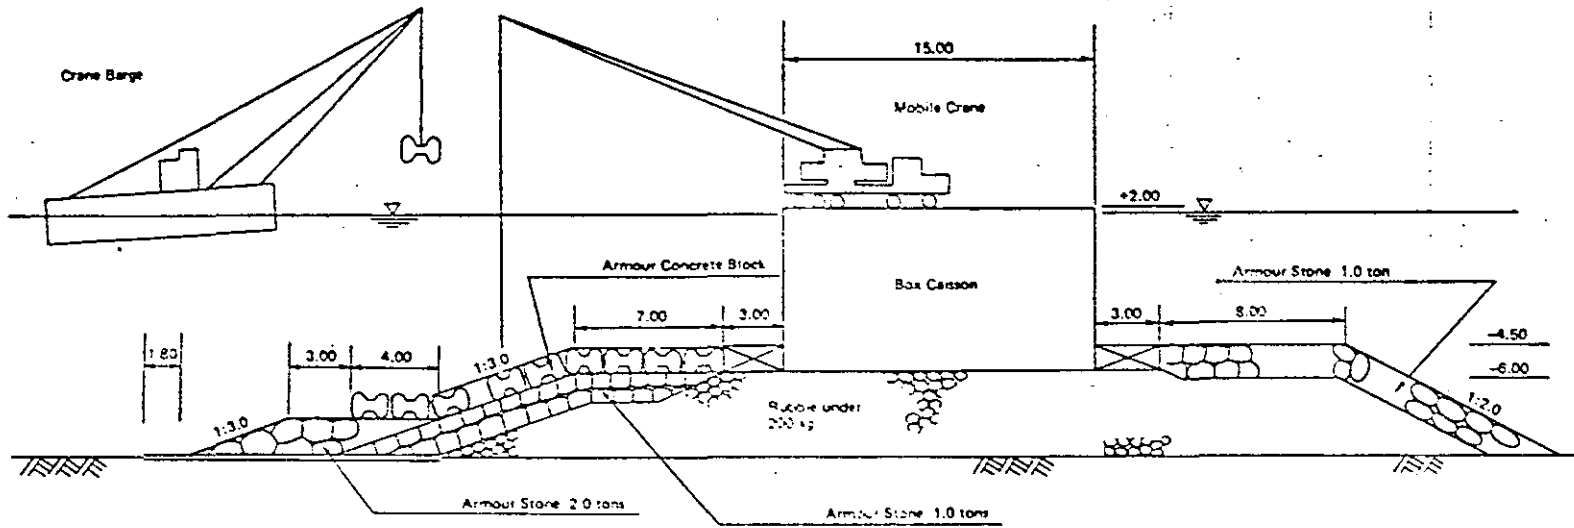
Example, Setting Works of Armour Concrete Block
